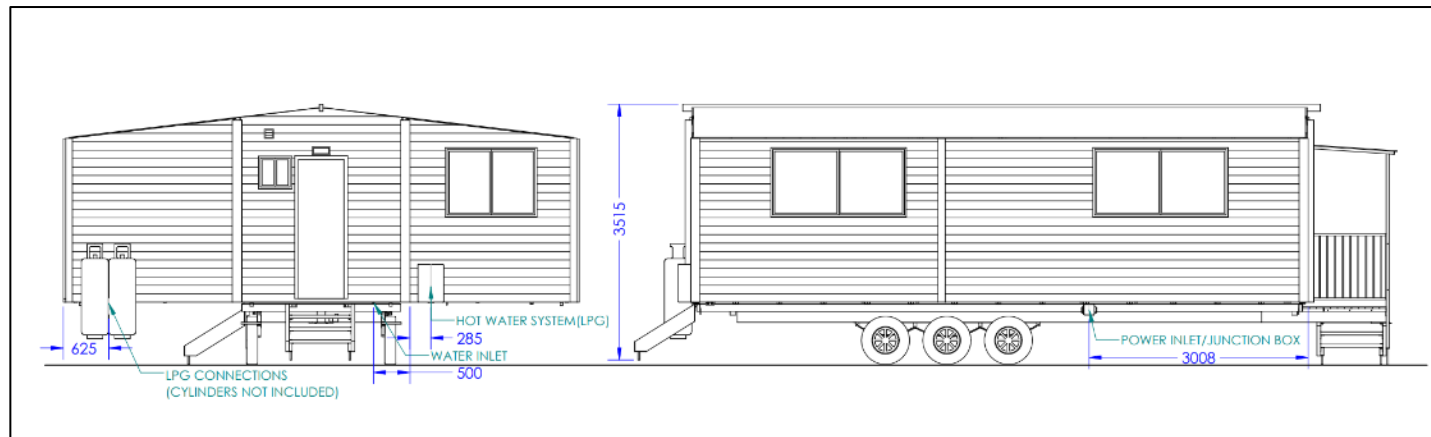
Proposed Elevations (MAS Pty Ltd, 2025)
